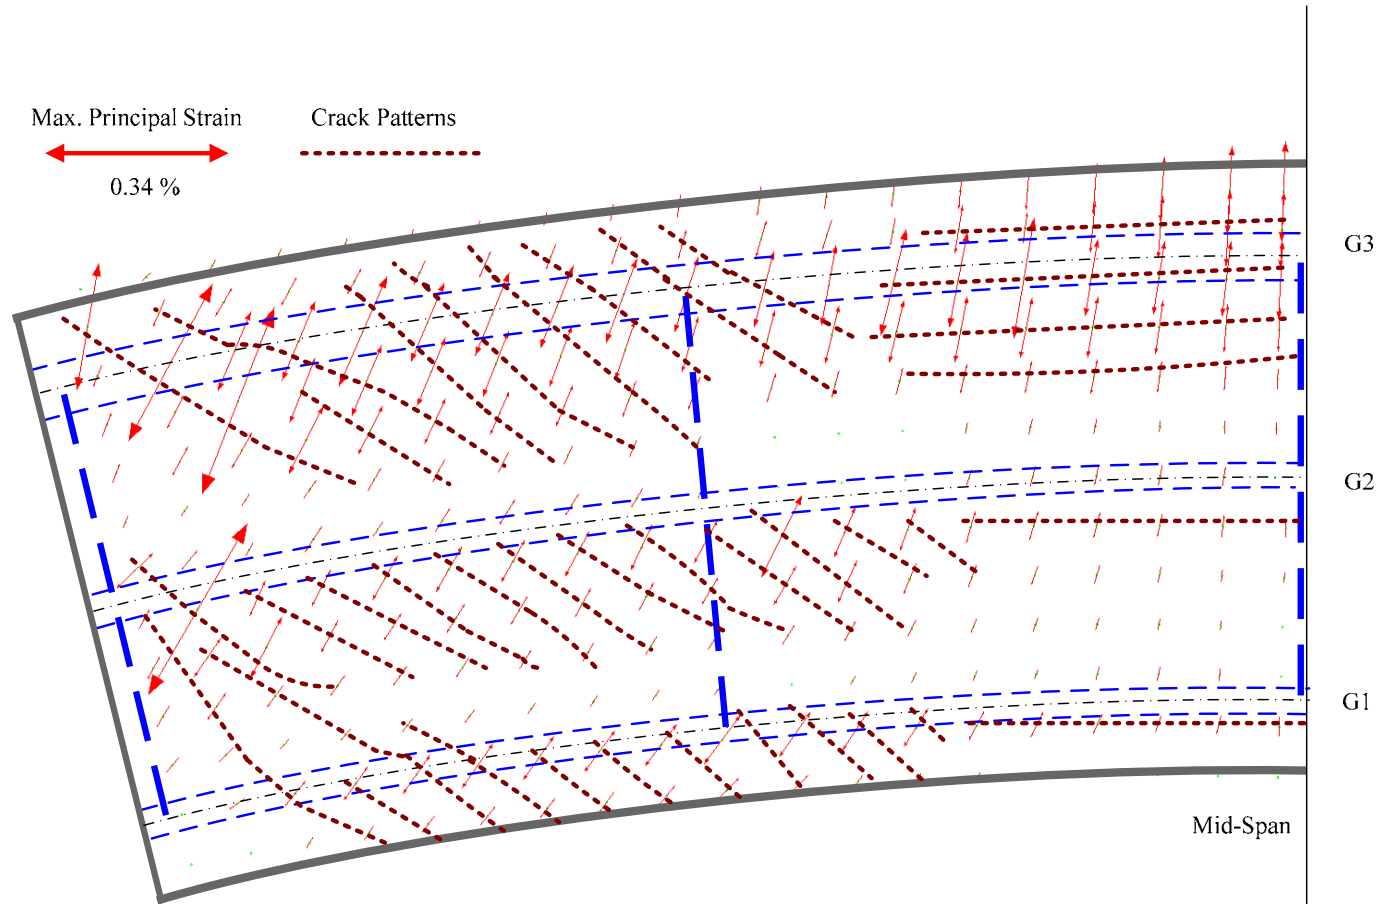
Plan view of the composite test bridge FEA model with computed maximum principal strains and corresponding crack patterns on the top surface of the slab at spalling and crushing of the slab concrete in the experimental test, deflection of the midspan outside tip of the G3 bottom flange = 610 mm (24 in), total applied load = 5783 kN (1300 kips).
